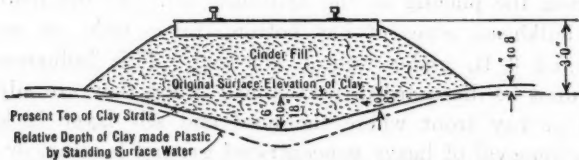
LATERAL DISPLACEMENT OF MOIST CLAY SUB-GRADE UNDER RAILROAD EMBANKMENT LOADING.
